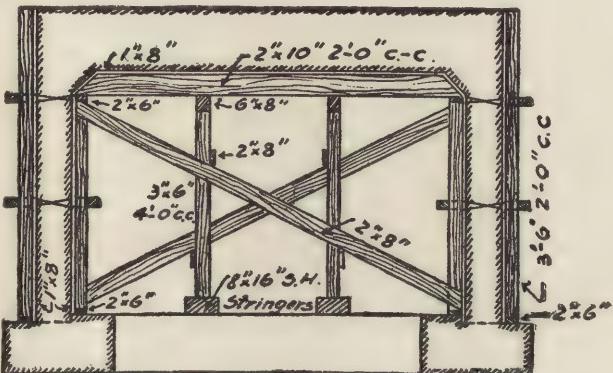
Section of Concrete Box Culvert, Showing Forms.
